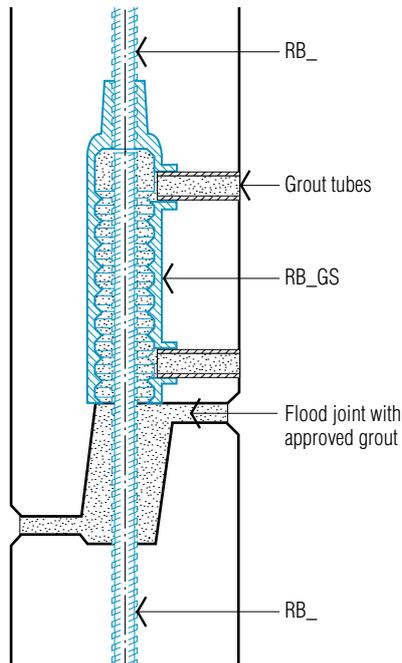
HORIZONTAL JOINT - REBATED PRECAST WALL PANELS
